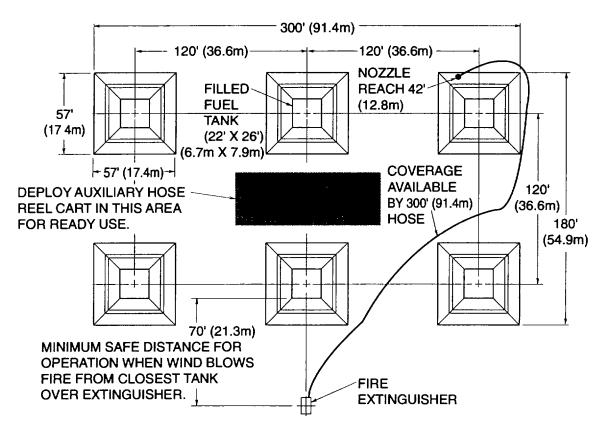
Location of Trailer Mounted Fire Extinguisher and Auxiliary Hose Reel Cart
